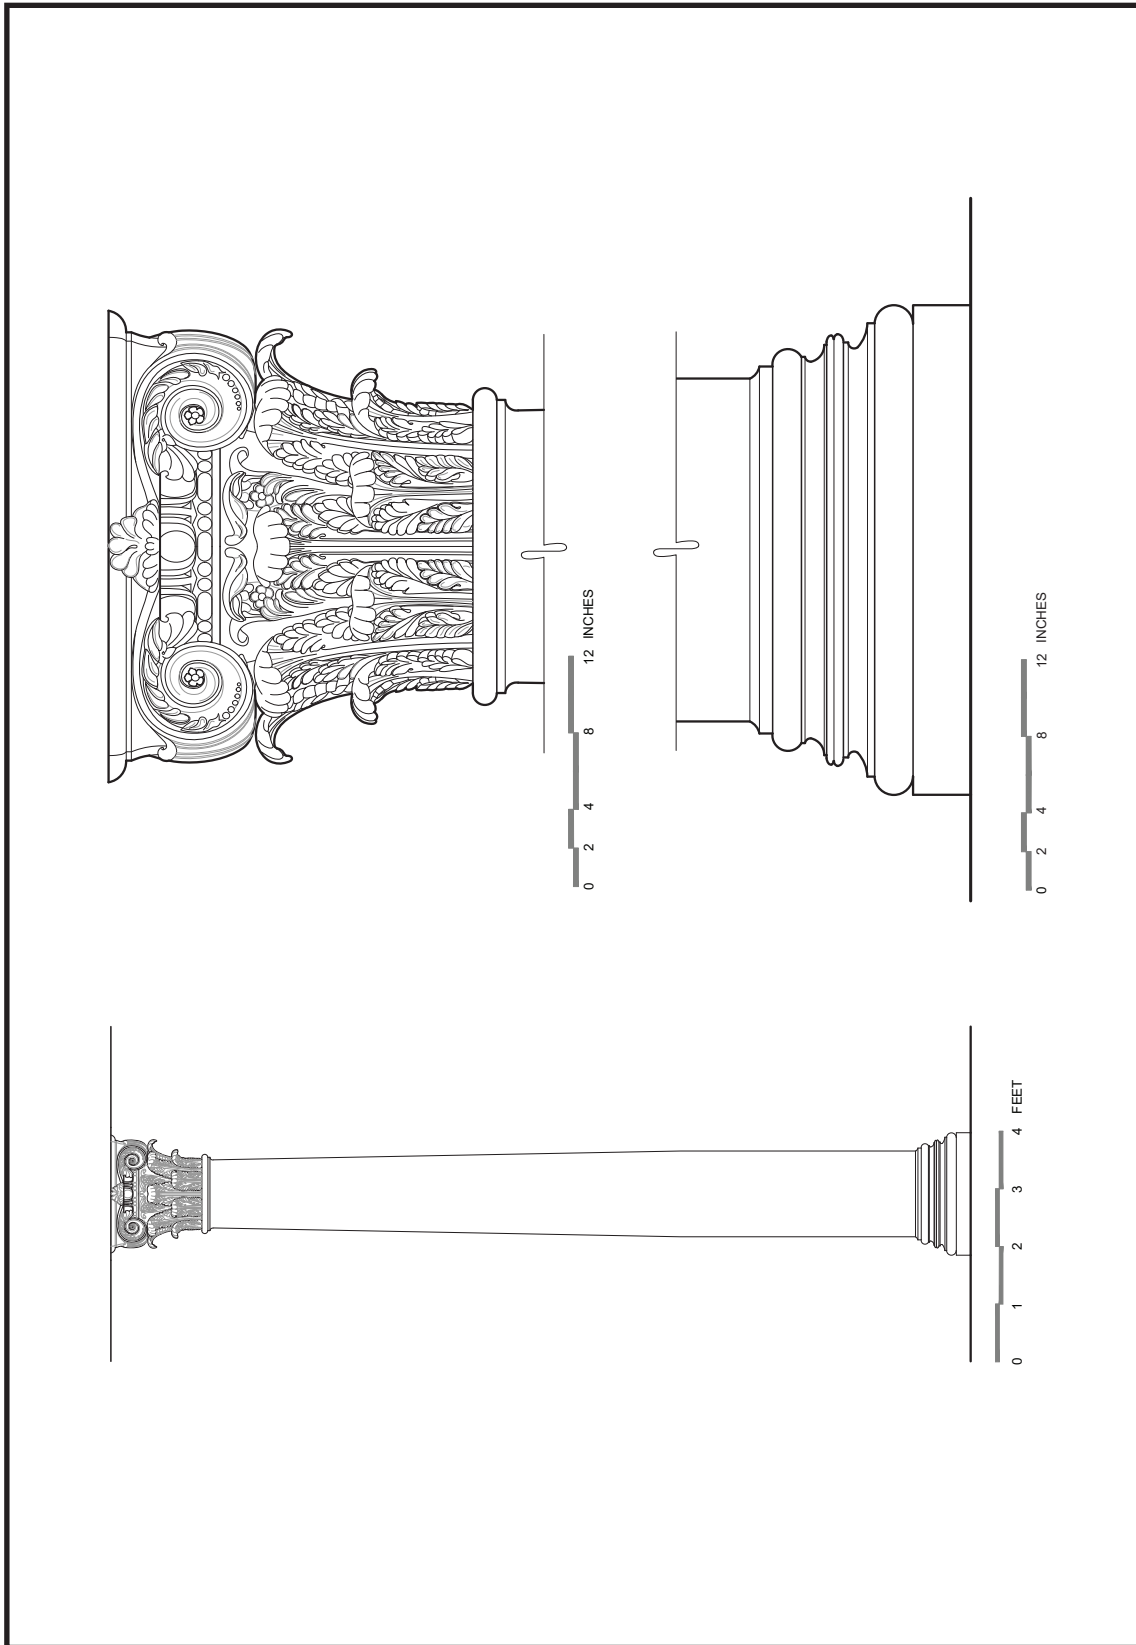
Details, interior column, Dome Room. Drawing by John G. Waite Associates, Architects, 2022.
